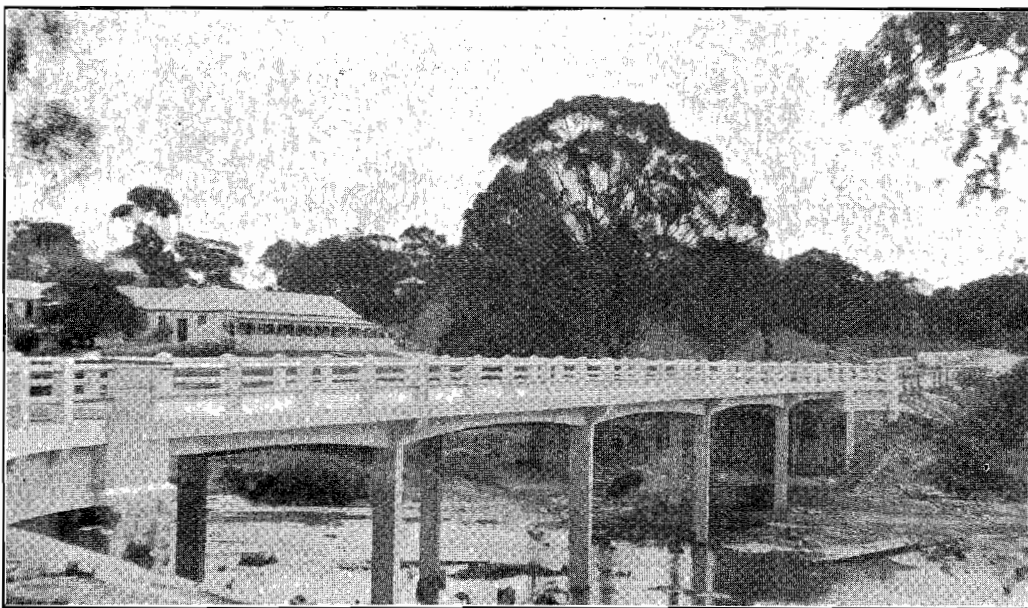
Reinforced Concrete Bridge at Pyalong.
